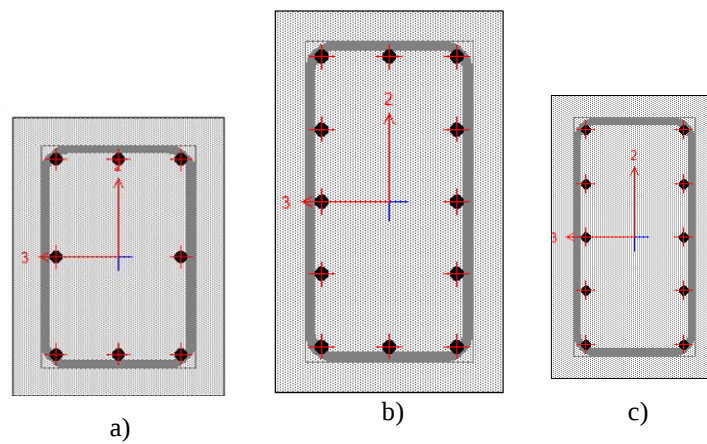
Beam cross-sections before concrete jacketing for (a) B1, (b) B2, and (c) B5
